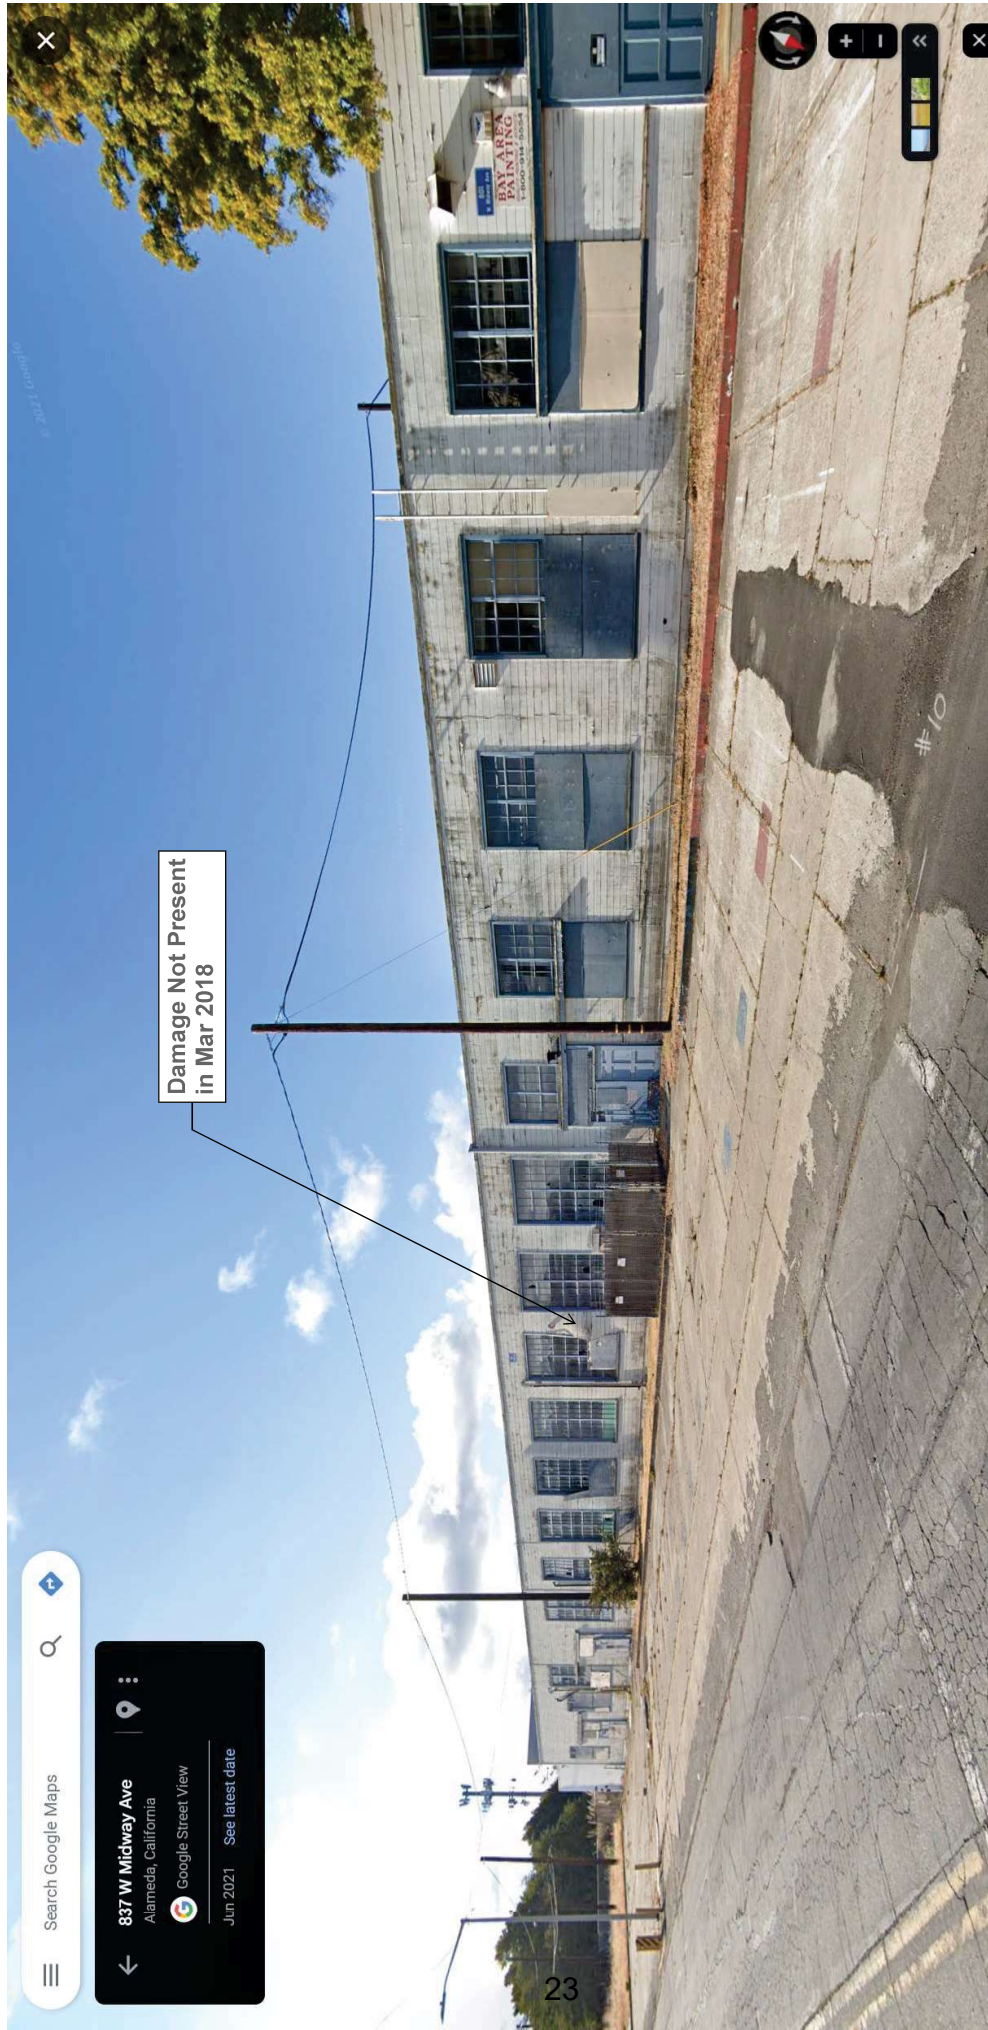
West Midway Avenue Google Street View Photo Taken June, 2021
